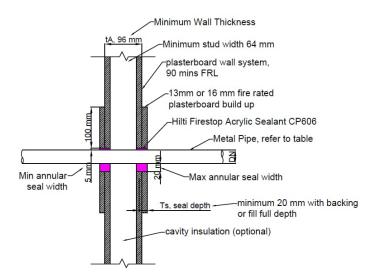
Non-insulated services penetrating -/90/90 and 90/90/90 framed walls
